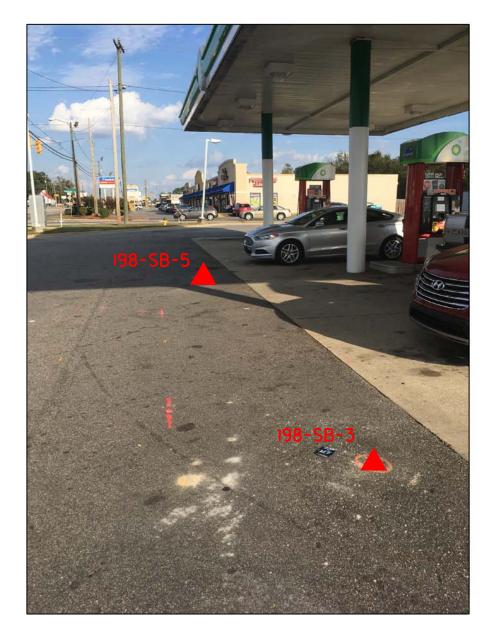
VIEW OF SOIL BORING LOOKING EAST PHOTO 4 - VIEW OF SOIL BORING LOOKING SOUTHEAST
